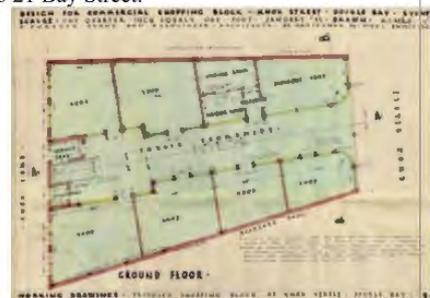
Evan's ground floor plan of the proposed "shopping block" at No 21 Bay Street. This drawing forms part of his set of working drawings dated January 1955.
